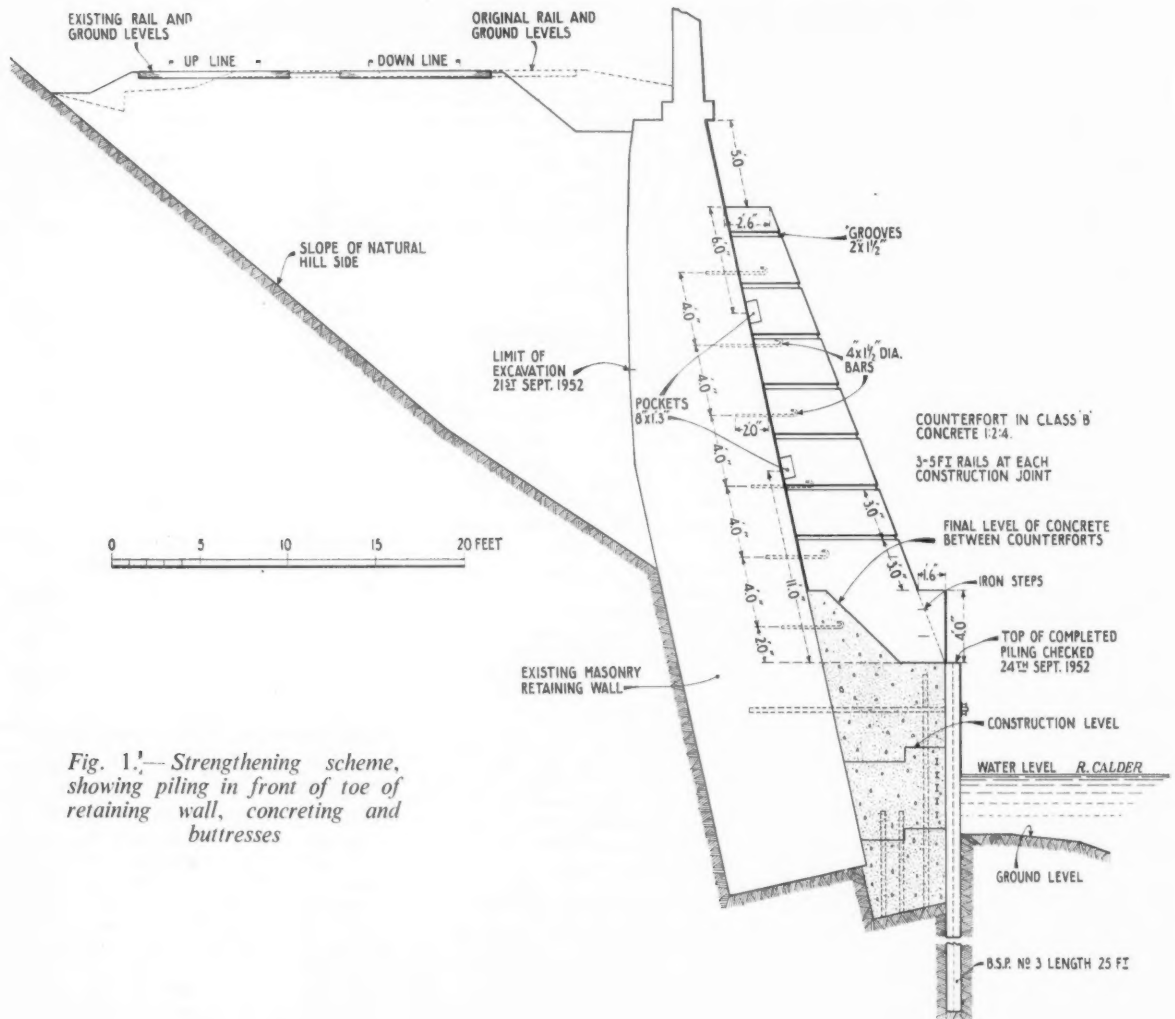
Strengthening scheme, showing piling in front of toe of retaining wall, concreting and buttresses
